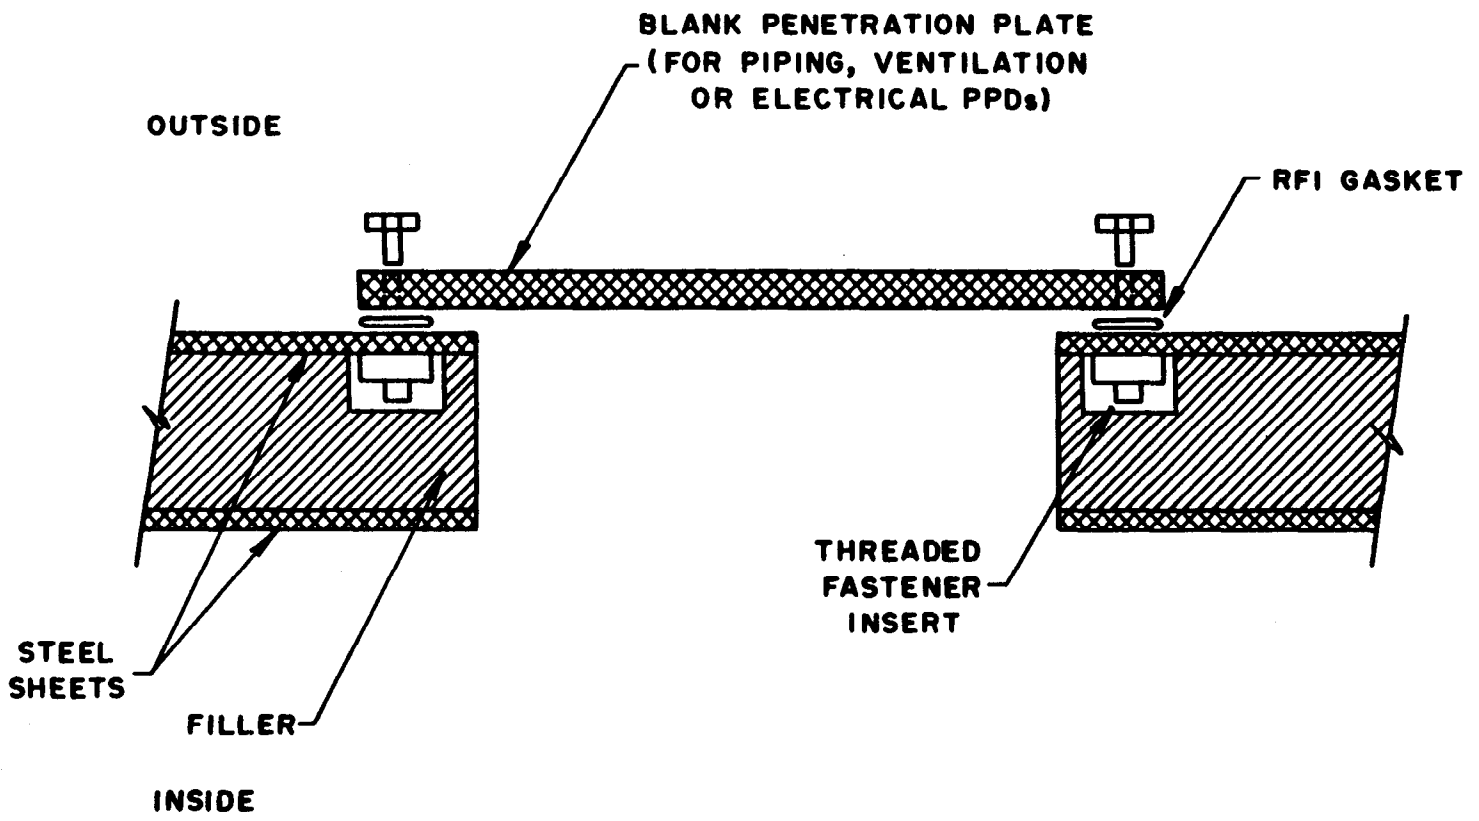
Typical penetration panel installation in a modular shielded enclosure.
